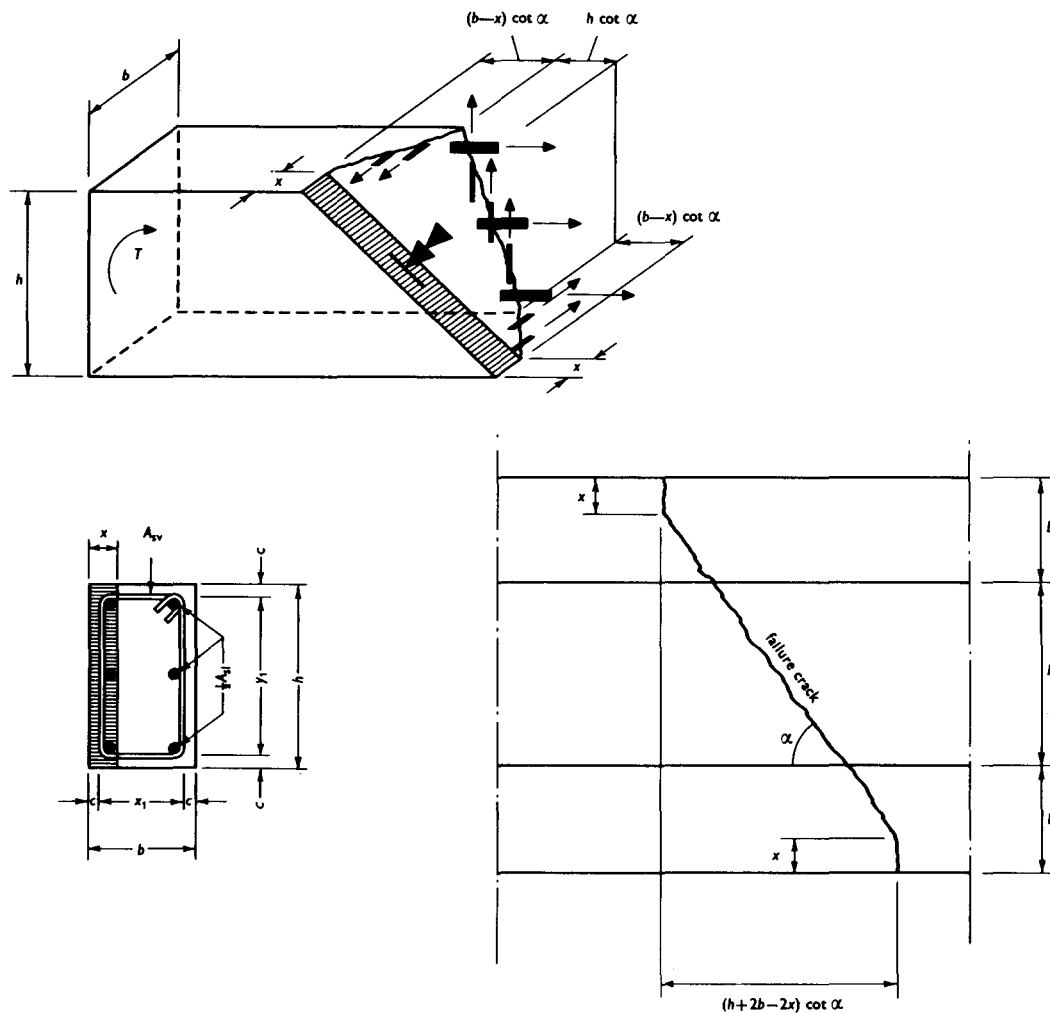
Assumed failure surface of reinforced concrete beams under pure torsion.
